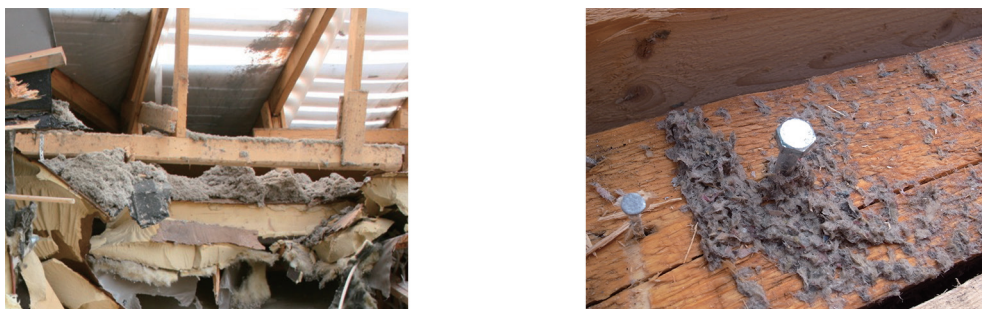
and 46b. View of 4"×4" in roof and the nails and crack
